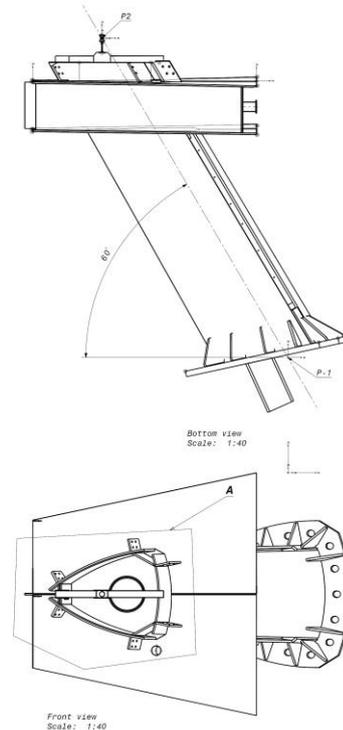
Drawing of the bottom shop section of the Pylon axis 3
